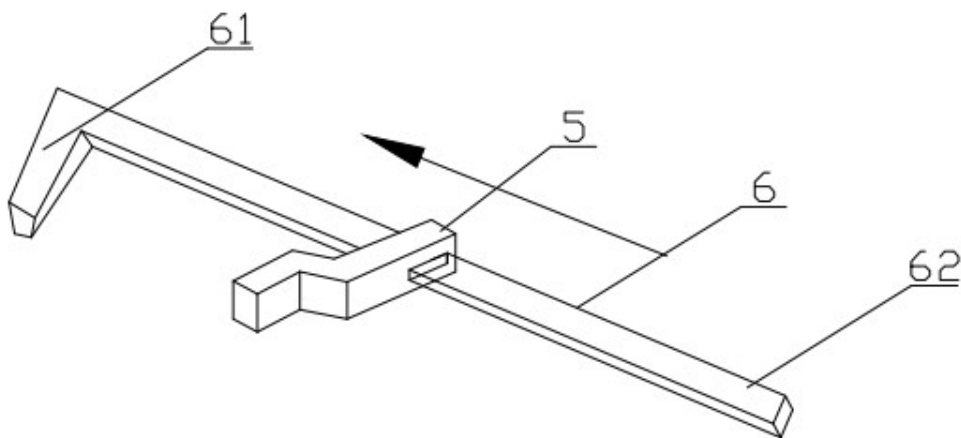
is a schematic diagram of the structure of the formwork support device for preventing concrete expansion
